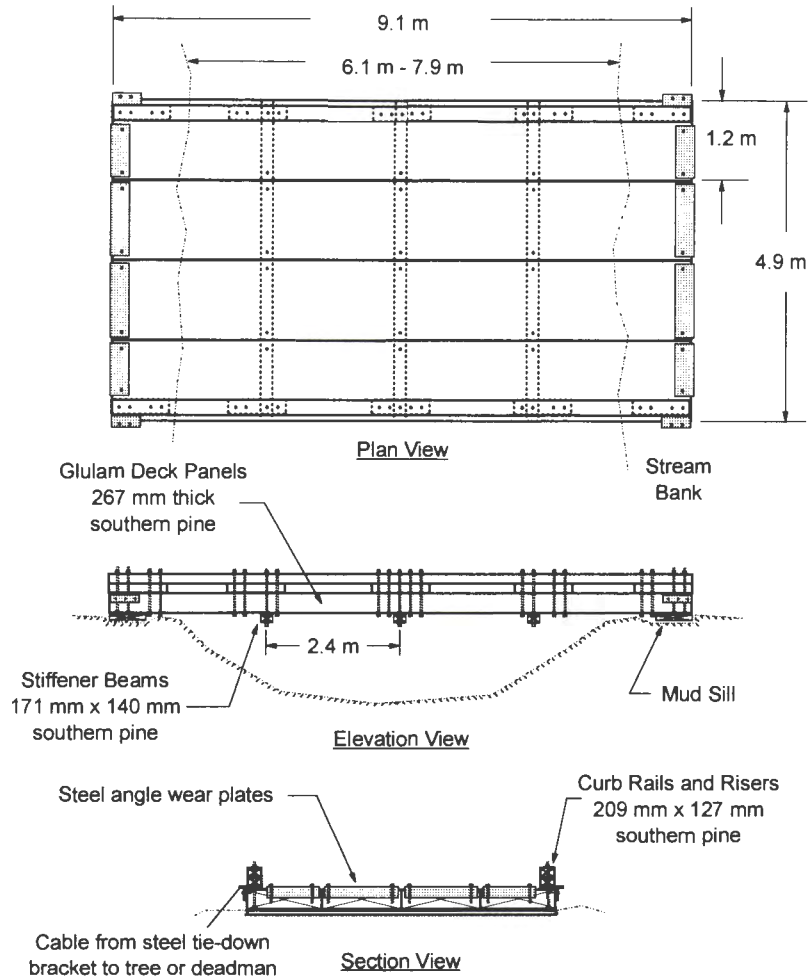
Design configuration of portable longitudinal glued-laminated timber deck bridge.
